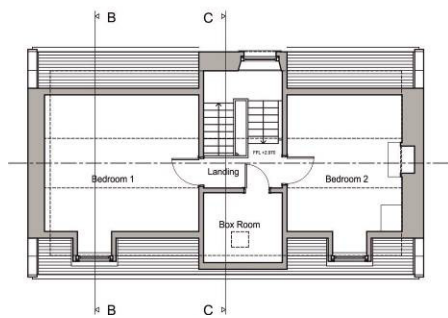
Building 8, Room Layout (©Dovecote Architecture)
